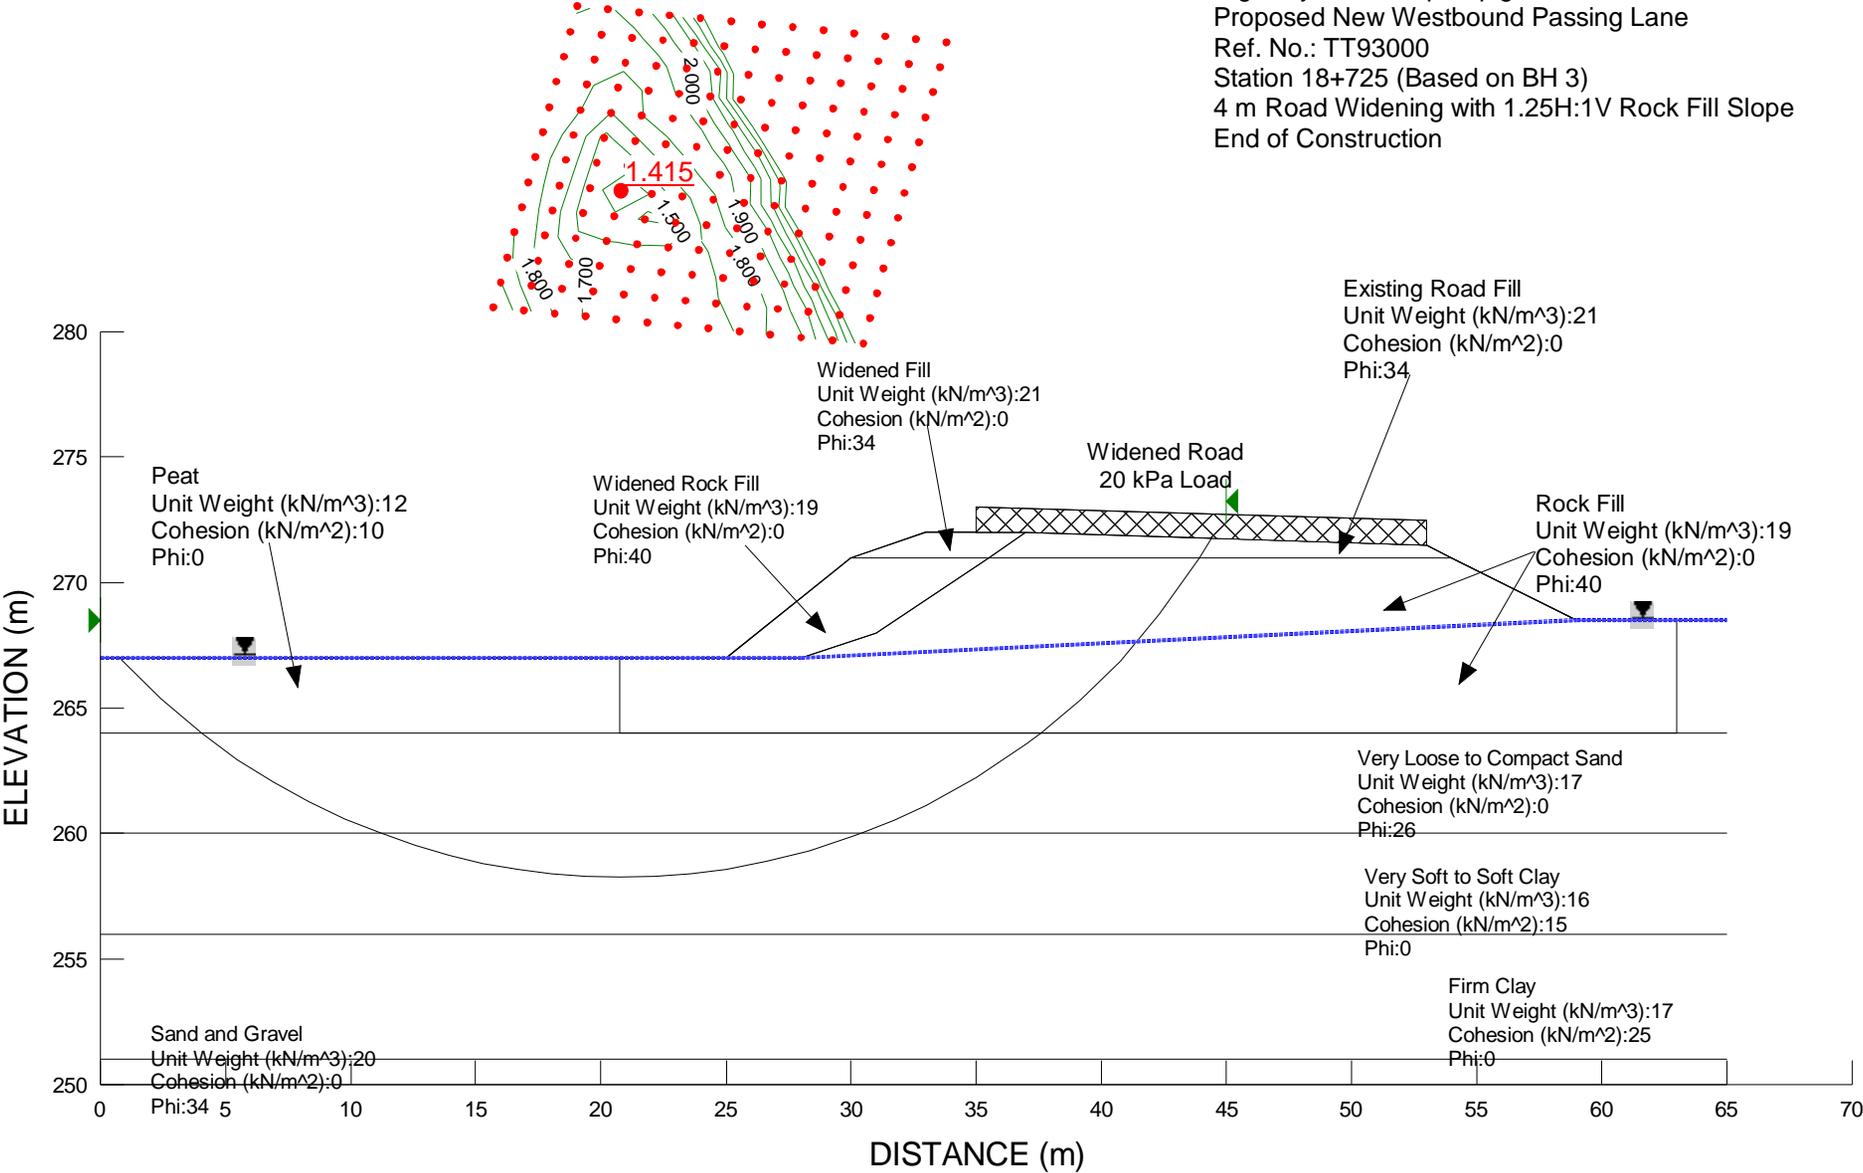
Slope Stability Analysis of Section at Station 18+725 with 4 m Road Widening (End of Construction - Slip Surface within Westbound Lane)
